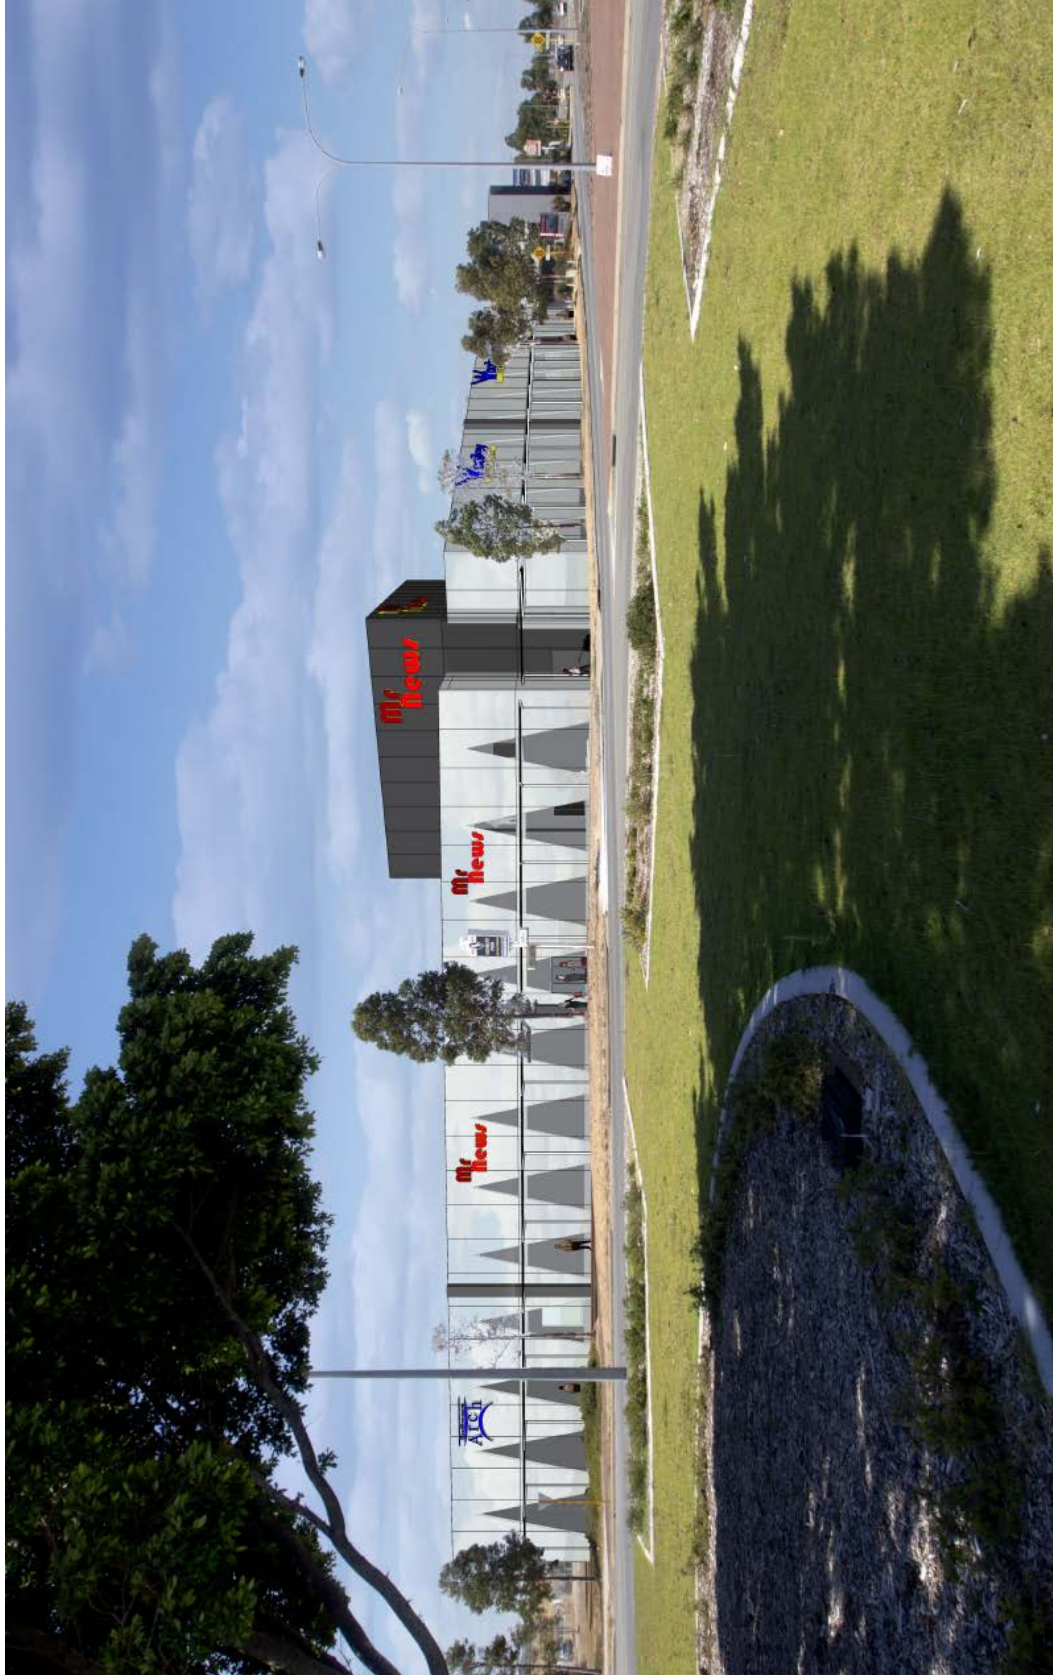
Perspective Plan (Safety Bay Road and Nairn Drive Intersection)
